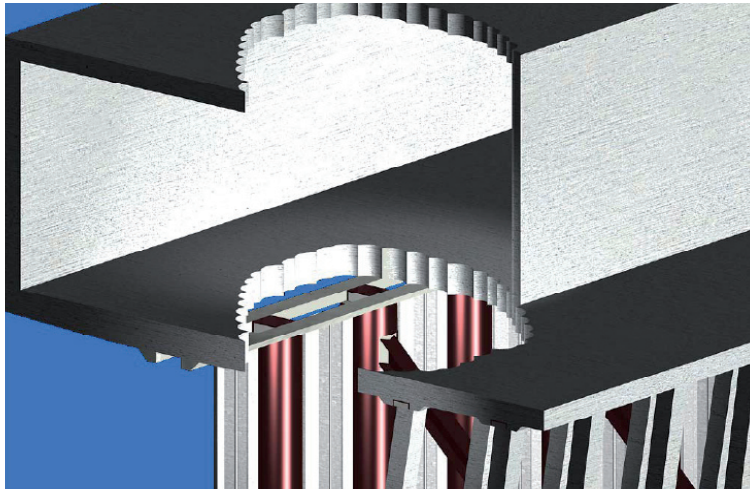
Detail of sliding construction between upper and lower parts of a quay wall
